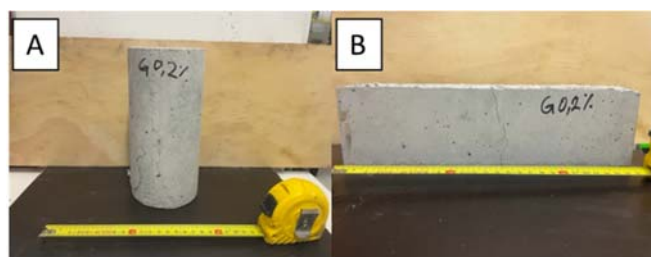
Concrete specimens: A) Cylindrical specimens for compressive strength test, B) Prismatic specimens for flexural strength test
